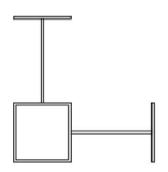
New section form of L-shaped steel columns 图 4. 新型 L 形钢异形柱截面形式
